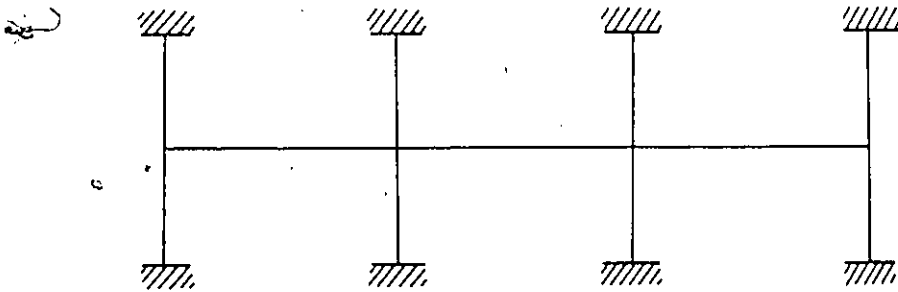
TYPICAL FLOOR FRAME used in gravity load analysis
